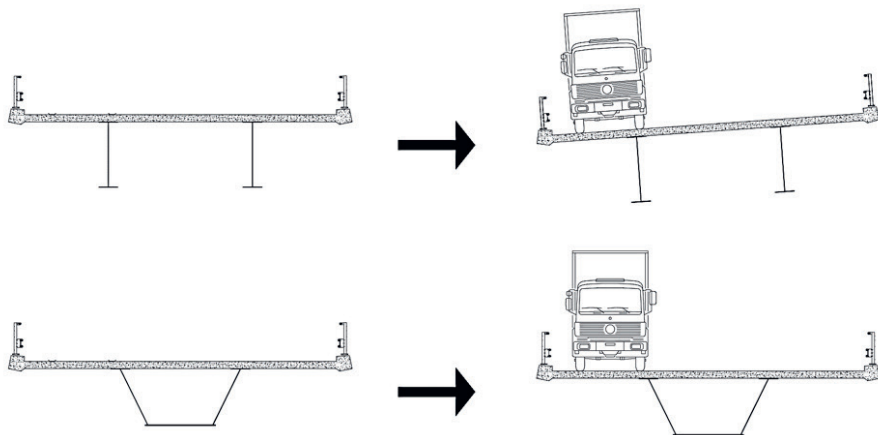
A schematic sketch of the deflection due to eccentric load on both an I-girder and box girder cross-section (excluding any warping effects).
